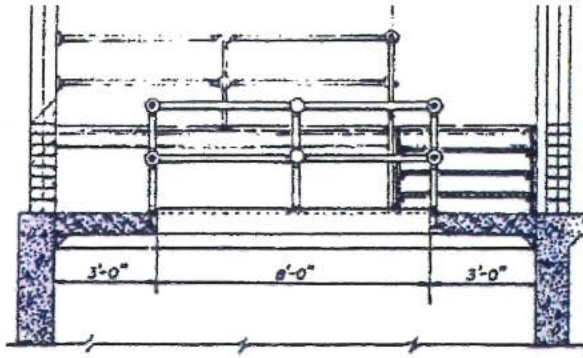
Section through First Floor of Northeast Addition Above Filter Room (1950 Drawings)
